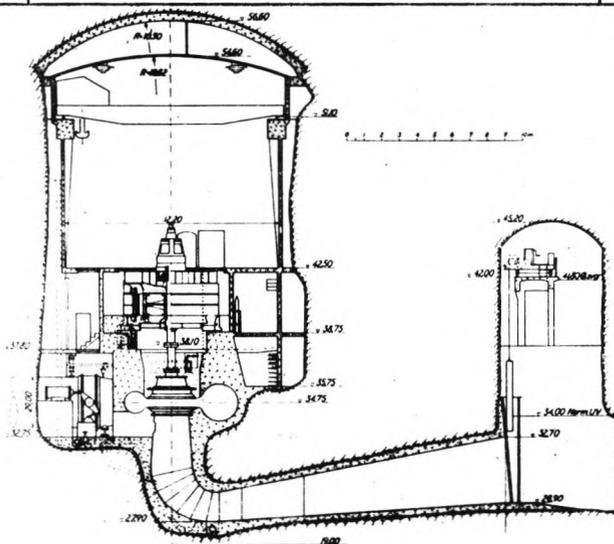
The Hol I power plant Section through surge chamber and valve chamber
